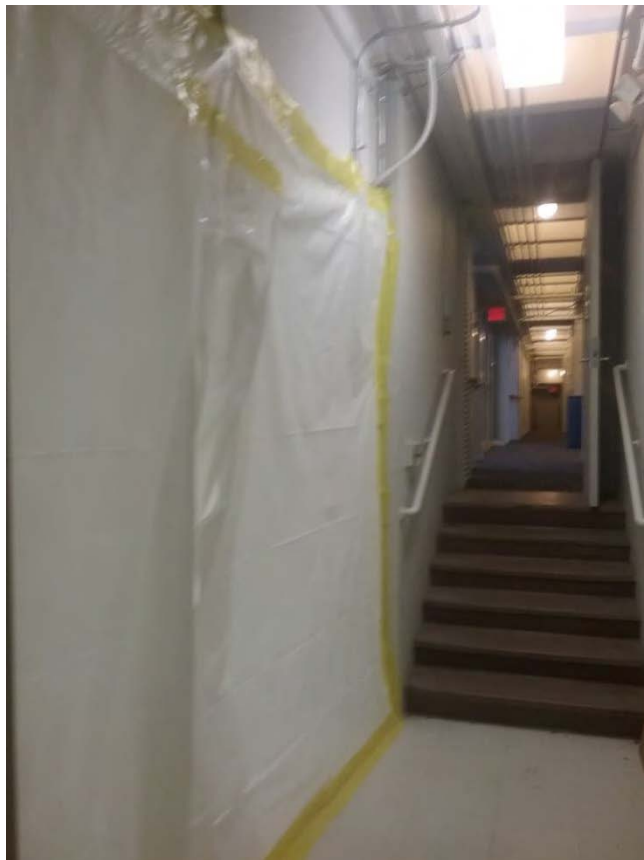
Depicting Critical installed at Entry to Multi-Purpose Room
